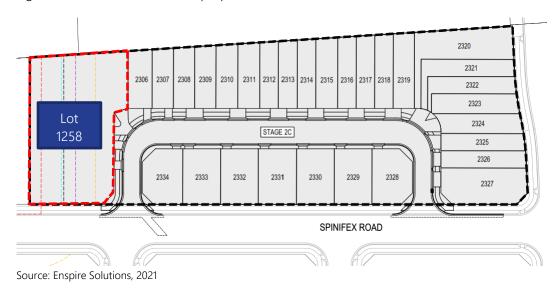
Internal access road and driveway crossovers proposed under DA21/0978
